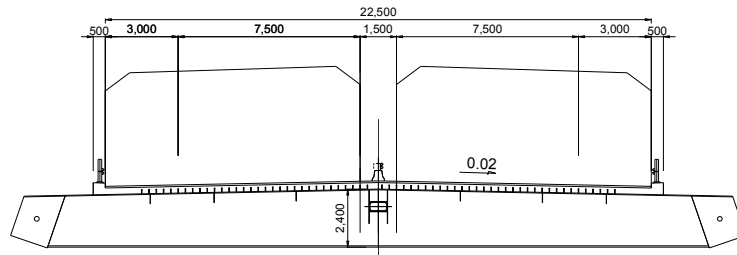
Road Width of Nguyen Trai Bridge
